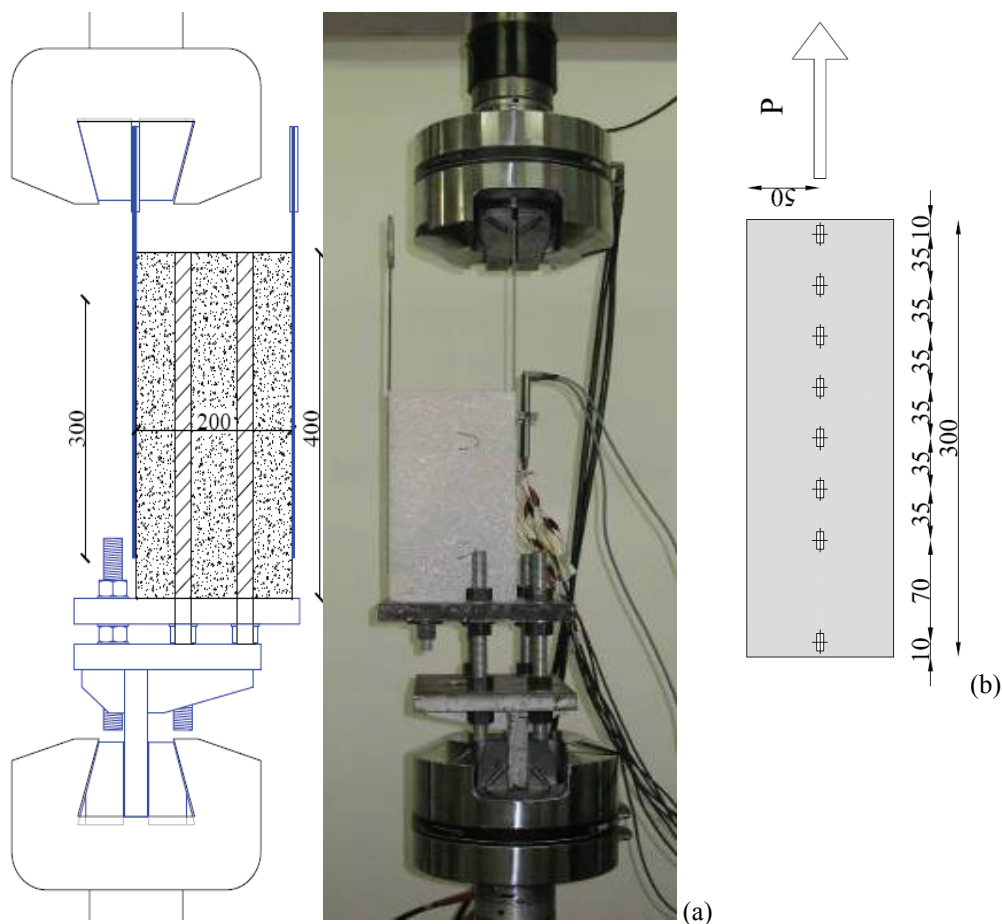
(a) Test setup; (b) Strain gauge positions (dimensions in mm)
